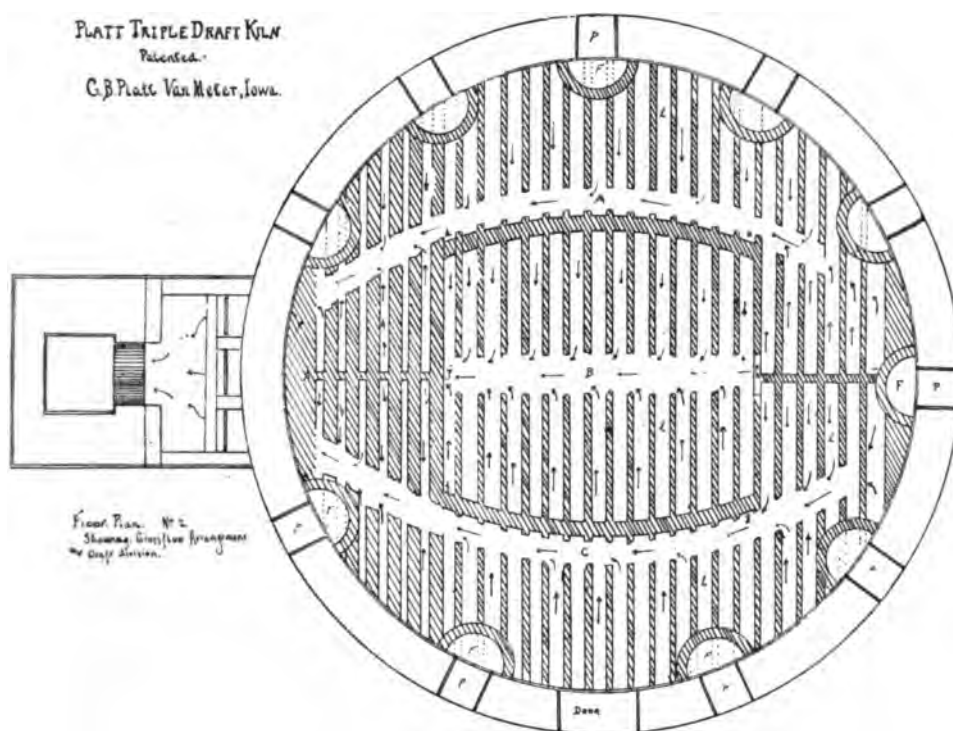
Floor plan, multiple stack, round down draft kiln.
